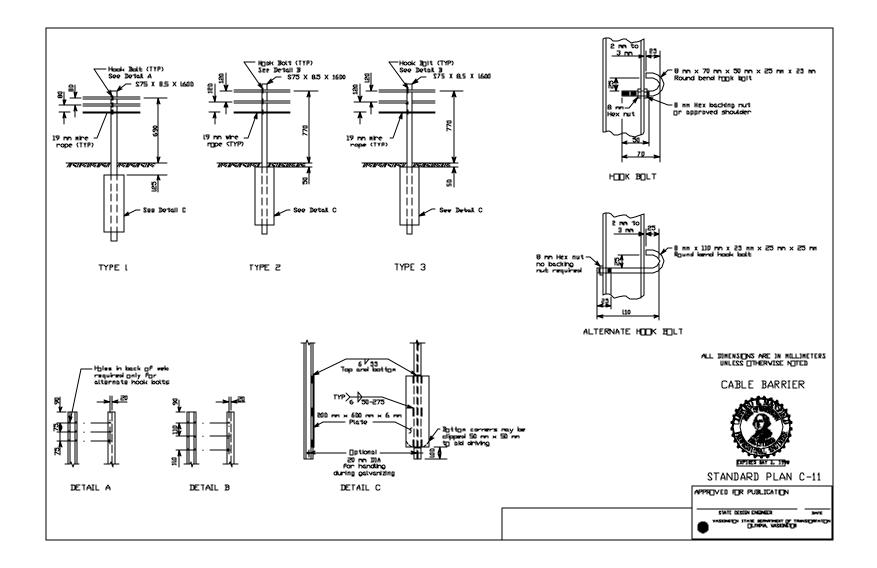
Details of the Washington 3-strand cable barrier for test 404211-8.
